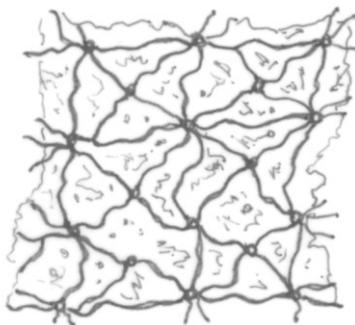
Reinforced wall with “cable-mesh” (other texture)
